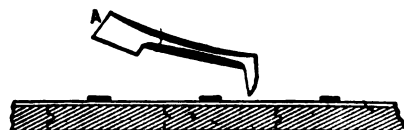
Section through Tin Roof Showing Scraper in Position for Use
